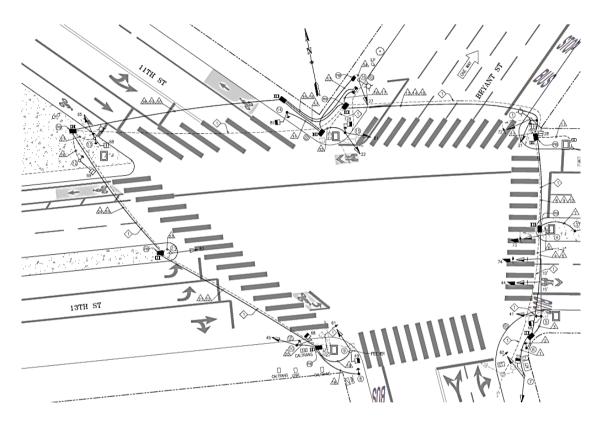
A – 13<sup>th</sup> Street EB Bicycle Facility - Striping Plan (Between South Van Ness Avenue and Harrison Street)
